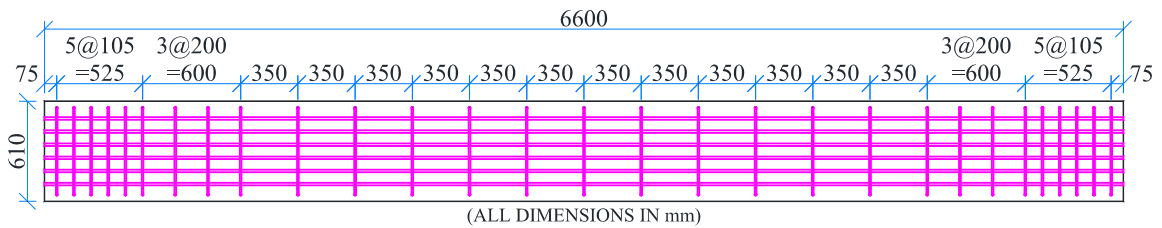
Stirrup location in GFRP Reinforced/Prestressed Slabs (TYP)
